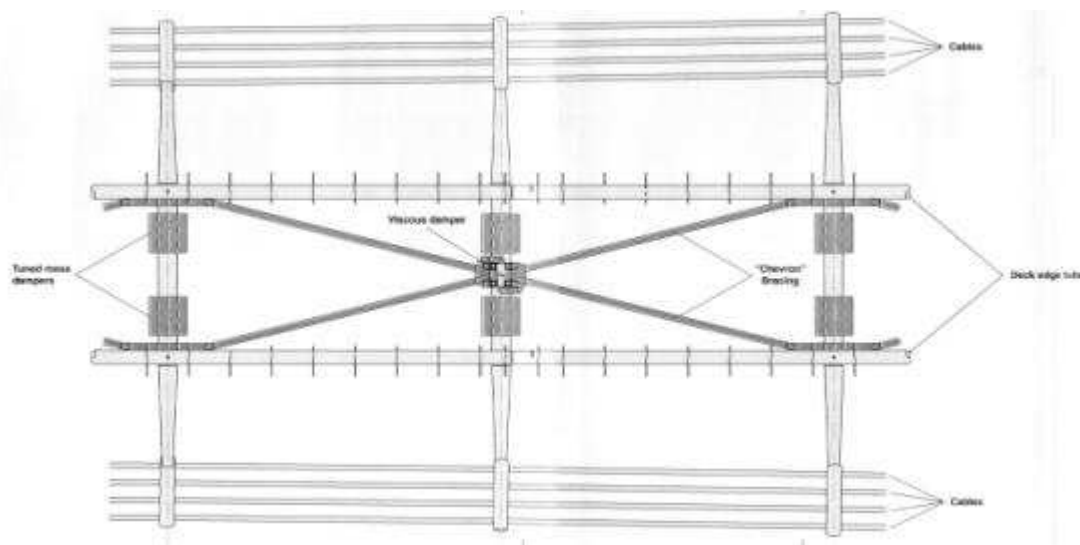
Plan view of underside of deck showing installation of dampers(from Fitzpatrick et al. 2001)
